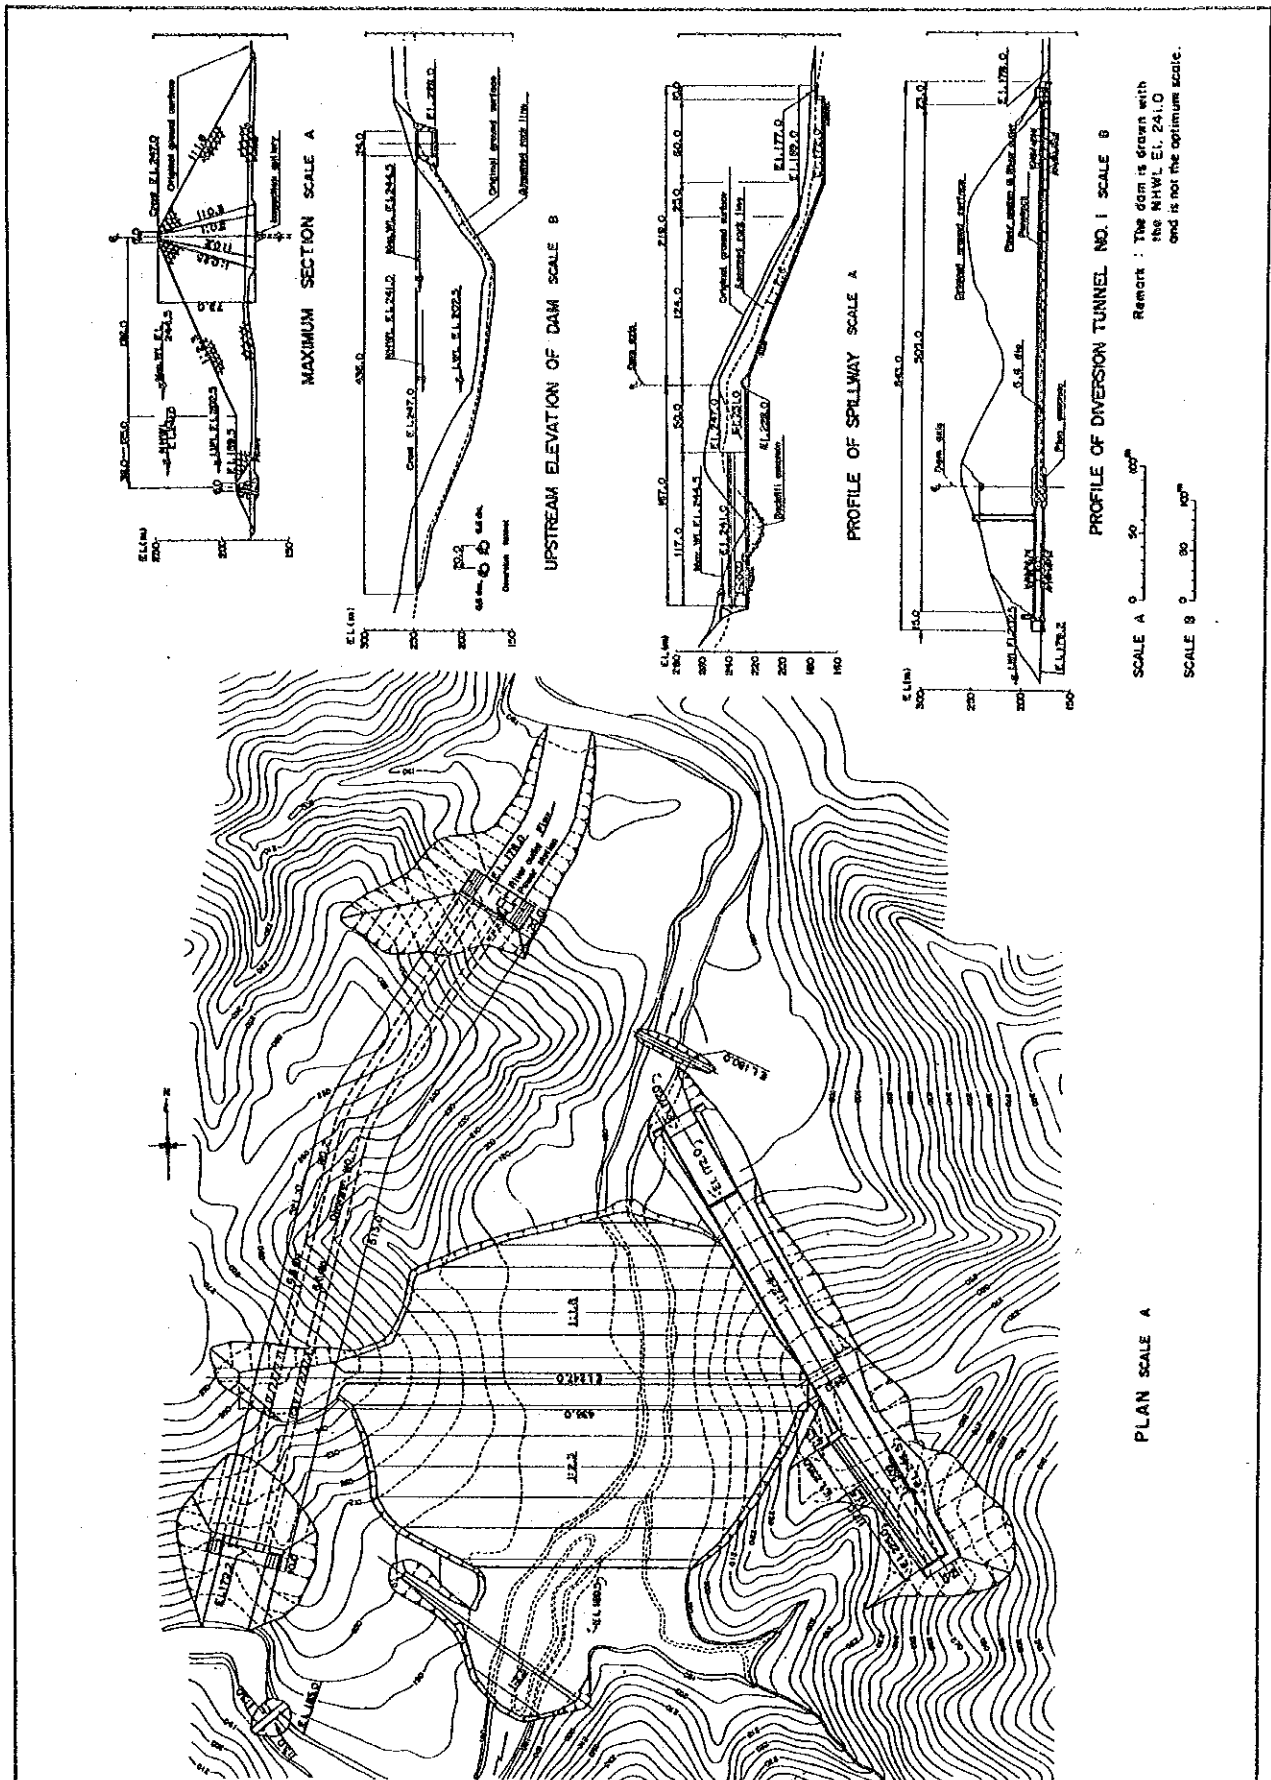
Plan, Elevation, Profile and Section of Rui 2 Dam
